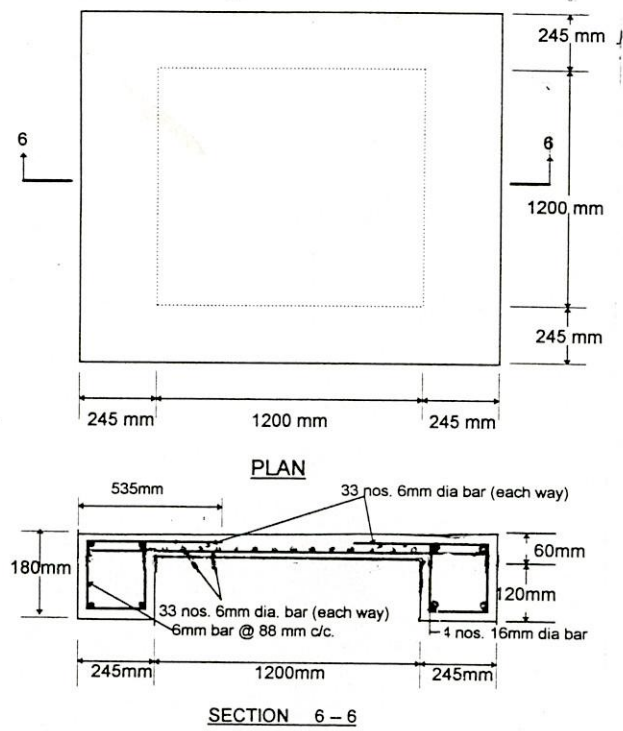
(a) Plan (b) Section and reinforcement details of SLAB6
